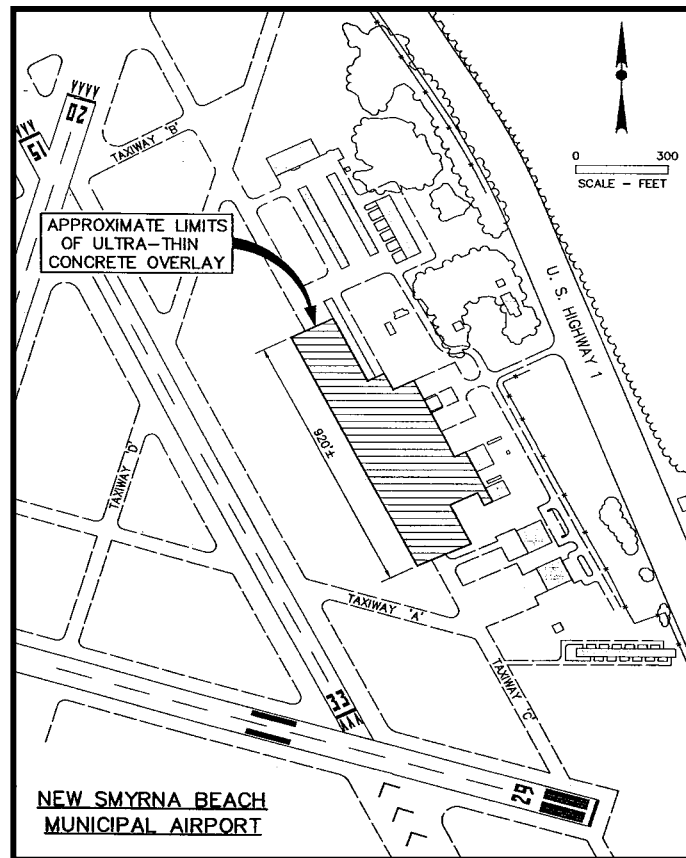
Layout of airfield pavements at the New Smyrna Beach Airport
